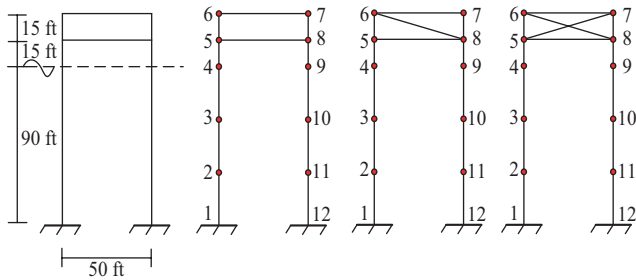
A one-bay template offshore structure with single, double bracings and dampers.
